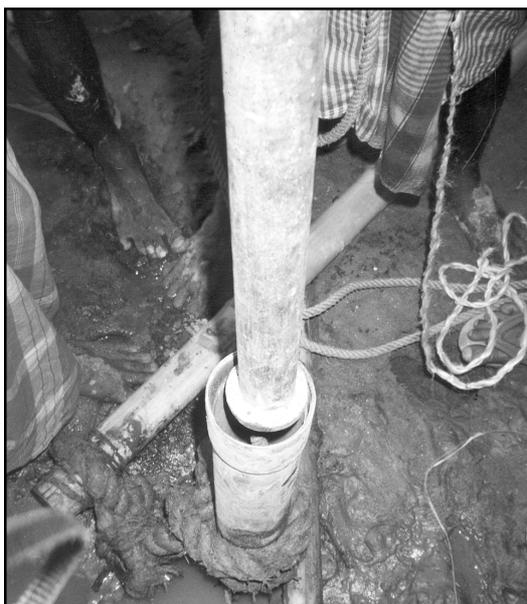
Lowering the blocking pipe for extracting the drill pipes by reverse hammering
